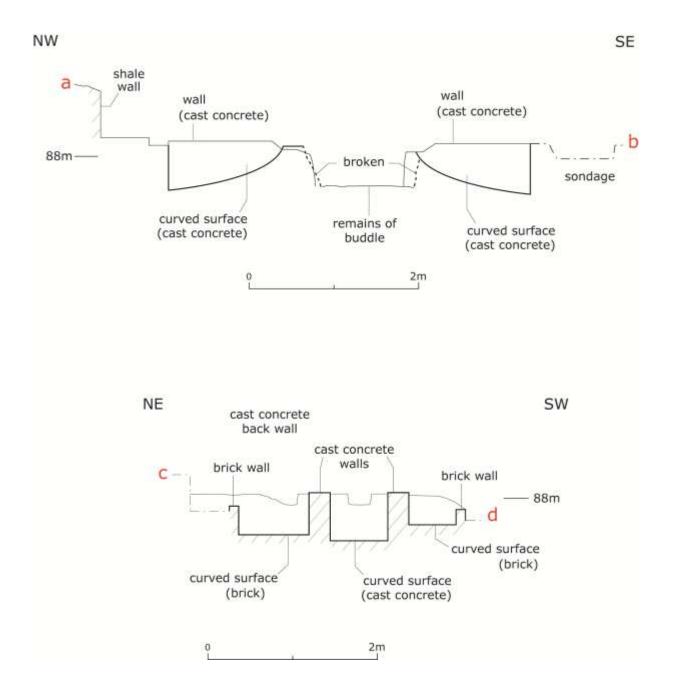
Cross sections through the sloping concrete and brick structures. The positions of the sections are shown in Figure 10.
